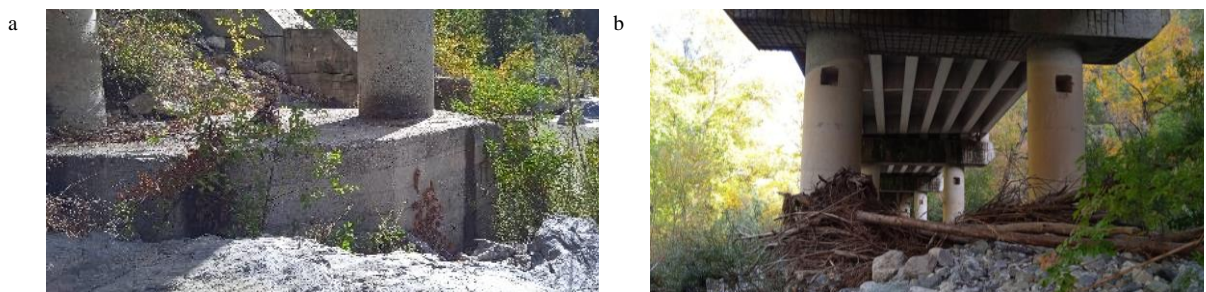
Viaduct I: (a) Pier foundation exposure upstream to the broken weir; (b) accumulation of floating material and debris at bridge piers.
